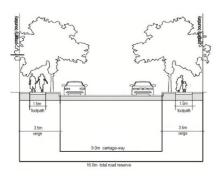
Typical Local Street Section - 16m (Source: Blacktown DCP)
